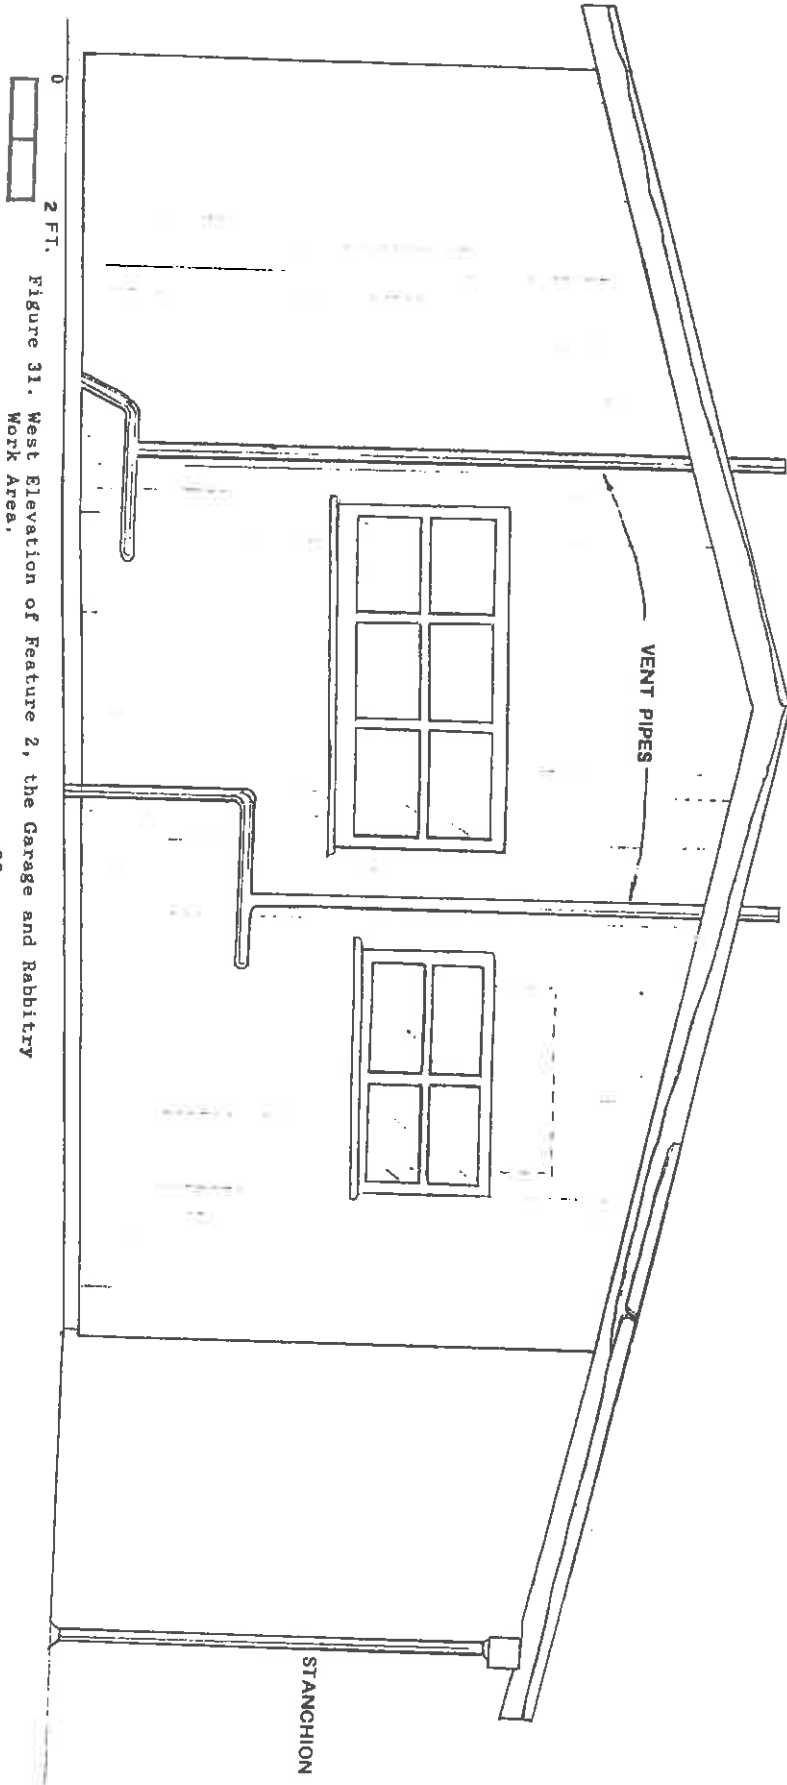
West Elevation of Feature 2, the Garage and Rabbitry Work Area.
